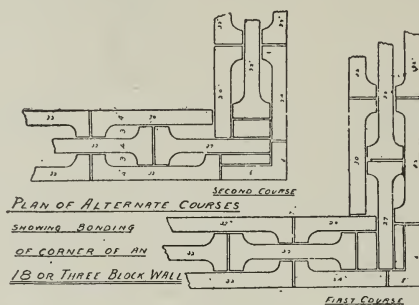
Angular Concrete Blocks. Eighteen-inch Wall.
